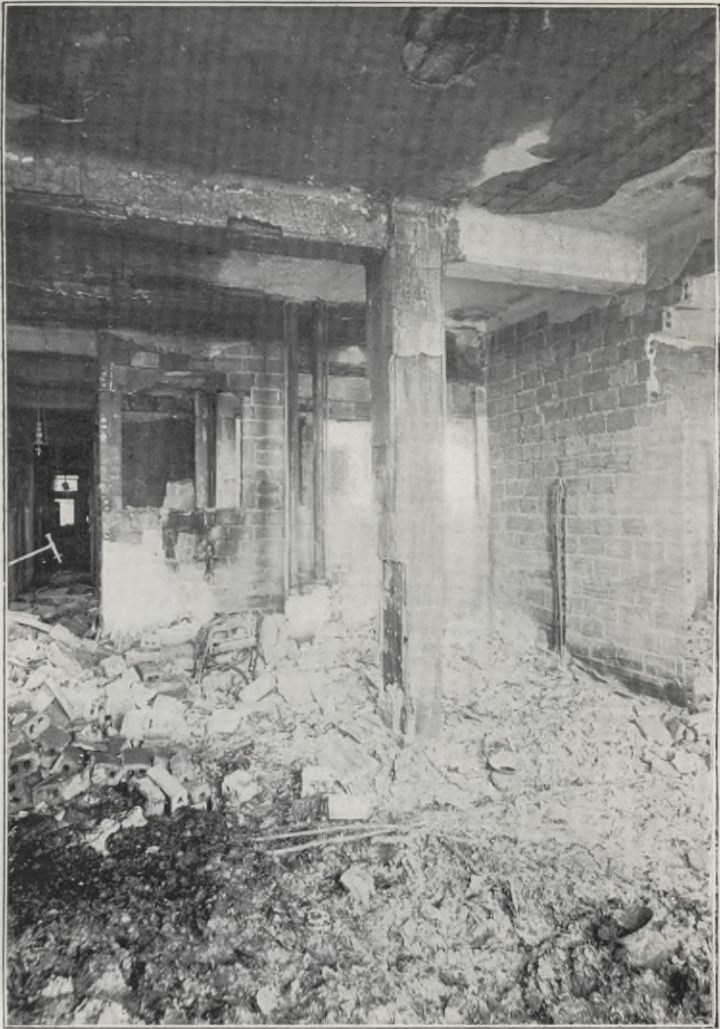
13TH FLOOR. THE COLUMN AND GIRDER ARE UNINJURED.
